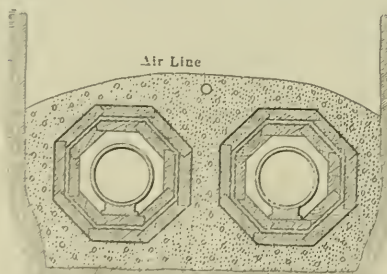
CROSS-SECTION OF CONDUIT FOR WATER LINE
